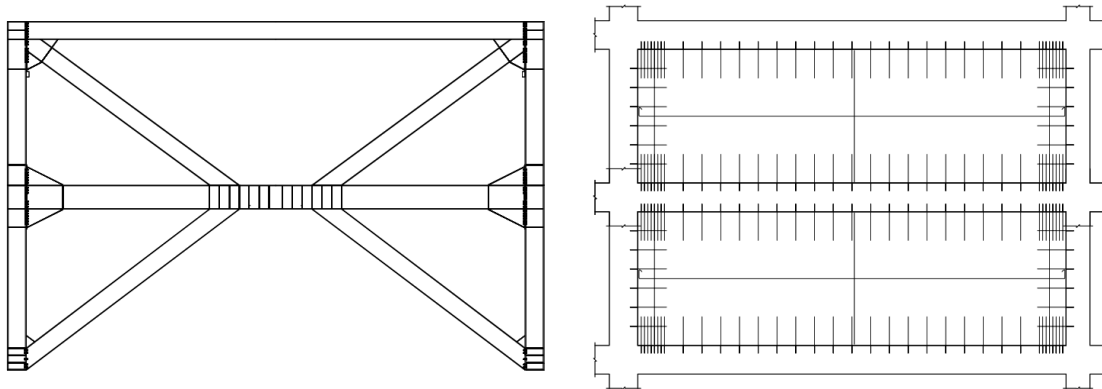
Steel X brace shear wall on the left and reinforced concrete shear wall on the right as two strengthening alternatives
